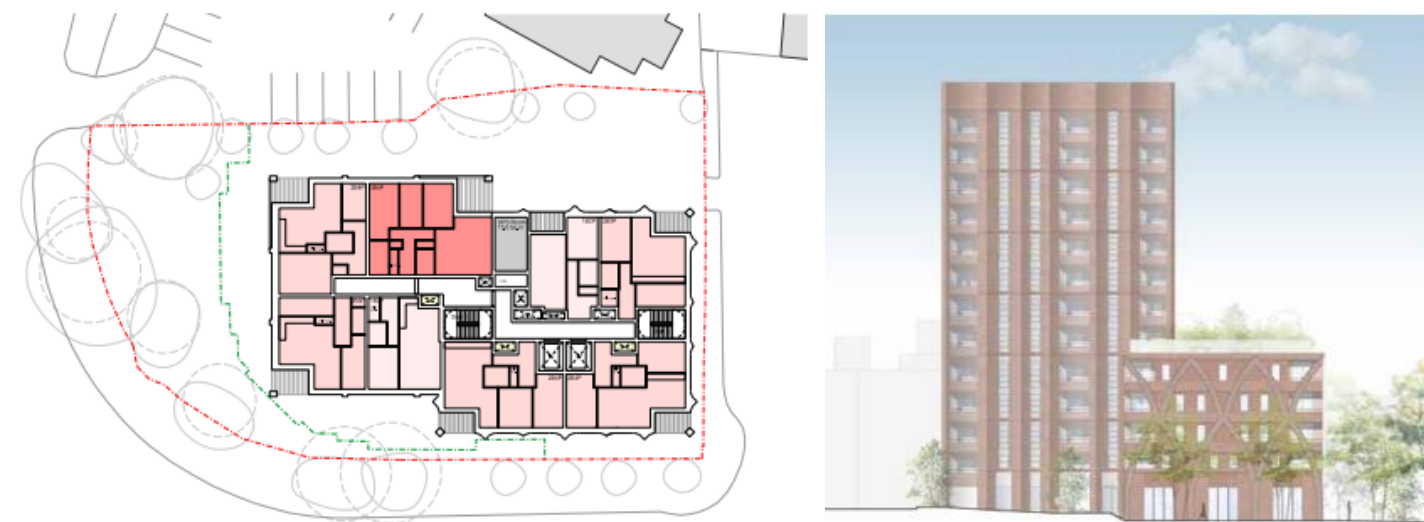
Typical floor plan and elevation of the proposed development (c/o Wimhurst Pelleriti)
